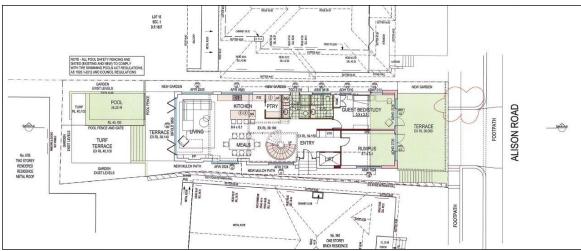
Proposed Ground Floor Plan (Urban Moose)
